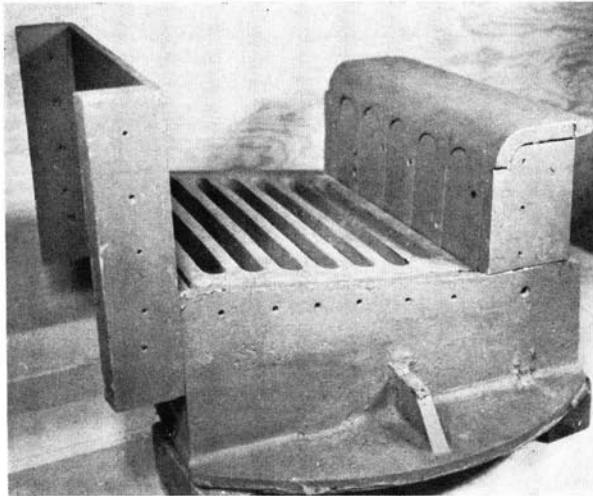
Type 3 Inlet Frame, New Standard Inlet Grate, Curb-Opening Closed
